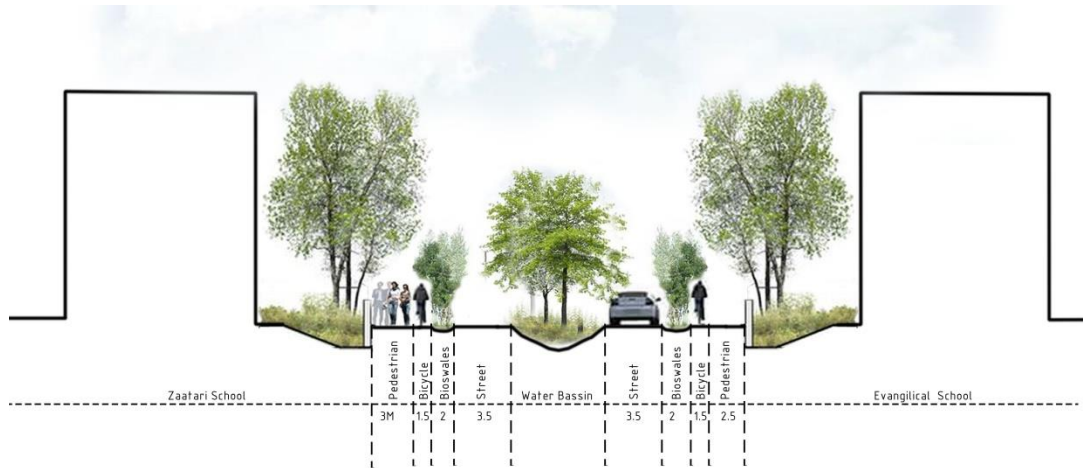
Detailed street section of the green corridor. Source Author, 2018.
